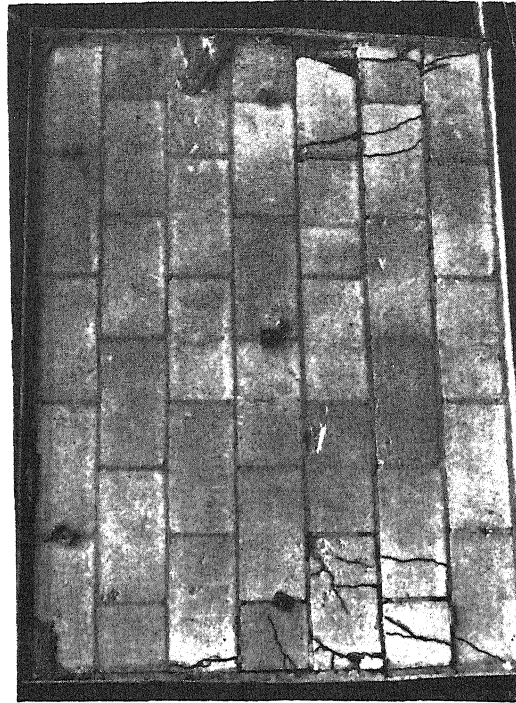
DAMAGED PATTERN OF REINFORCED WALL AFTER REINFORCEMENT REMOVED
